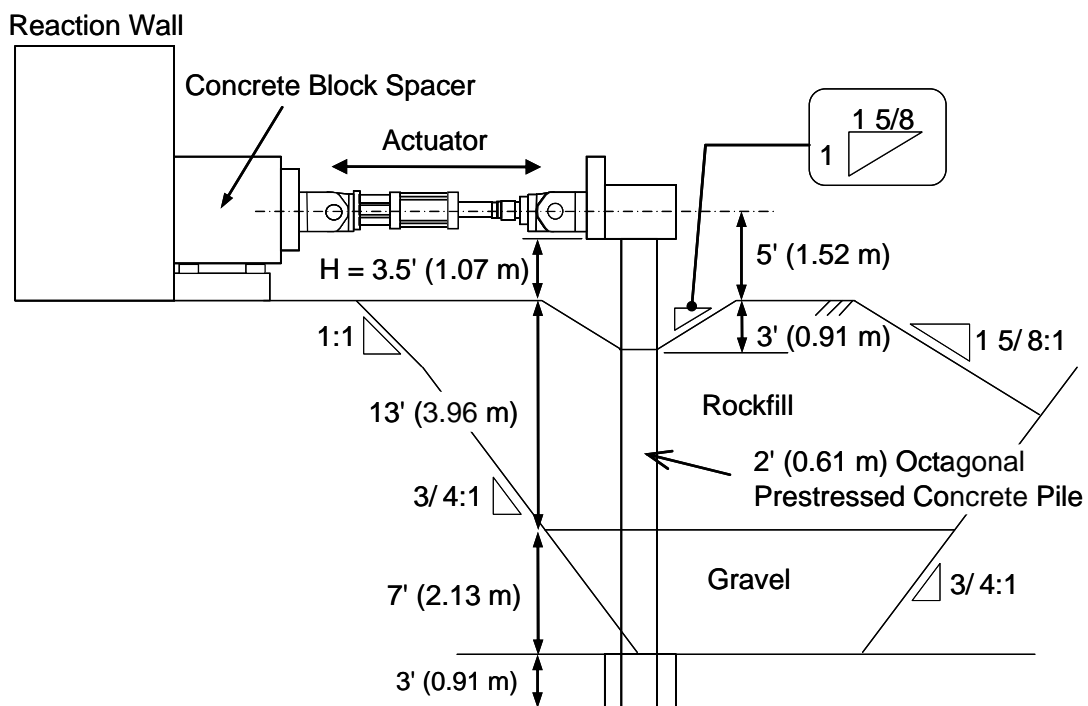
Section view for Single Pile Test 2 (after excavation)
